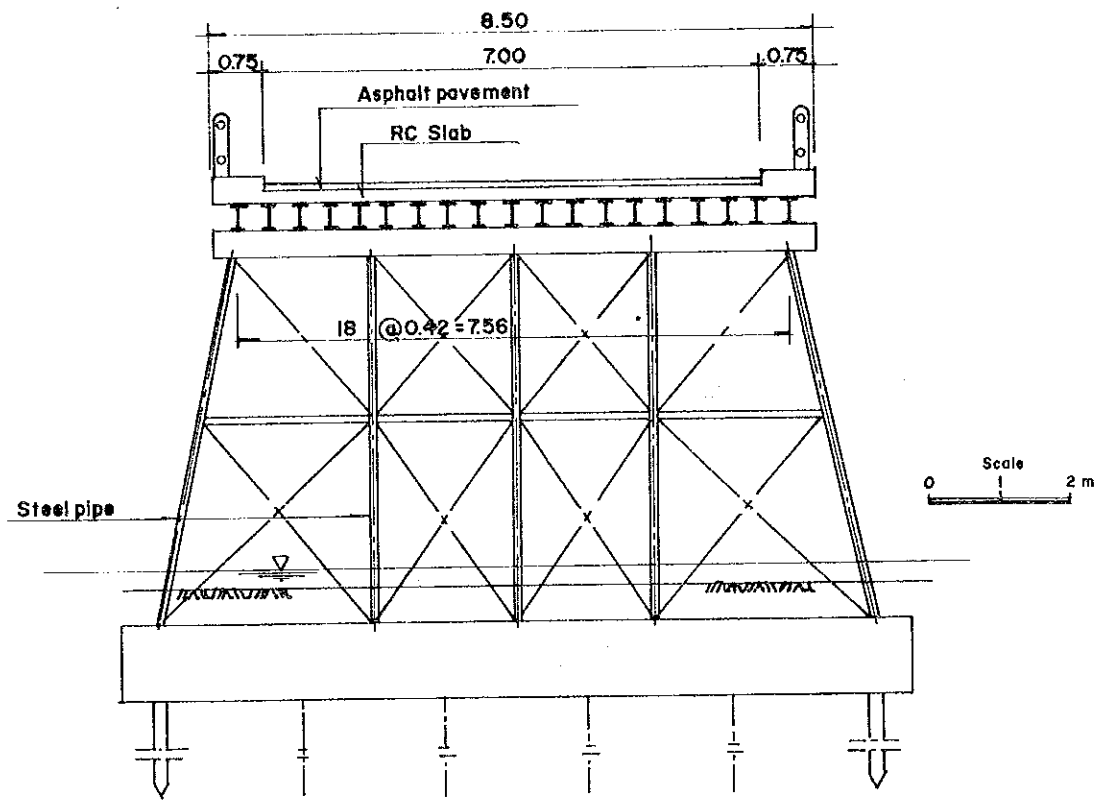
K. KEDUNGSOKO RAILWAY BRIDGE (1/5)
